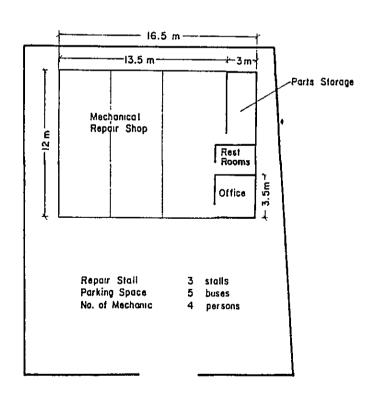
TYPICAL WORKSHOP IN PANAMA
